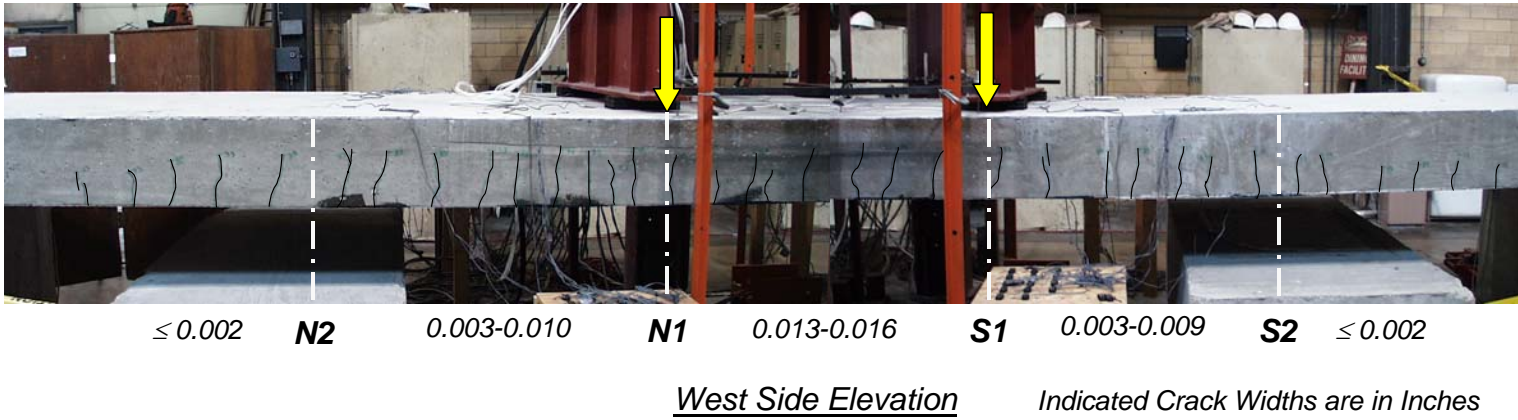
Cracking Pattern of Specimen FS-2 at Load Stage 2 (34 kip)
